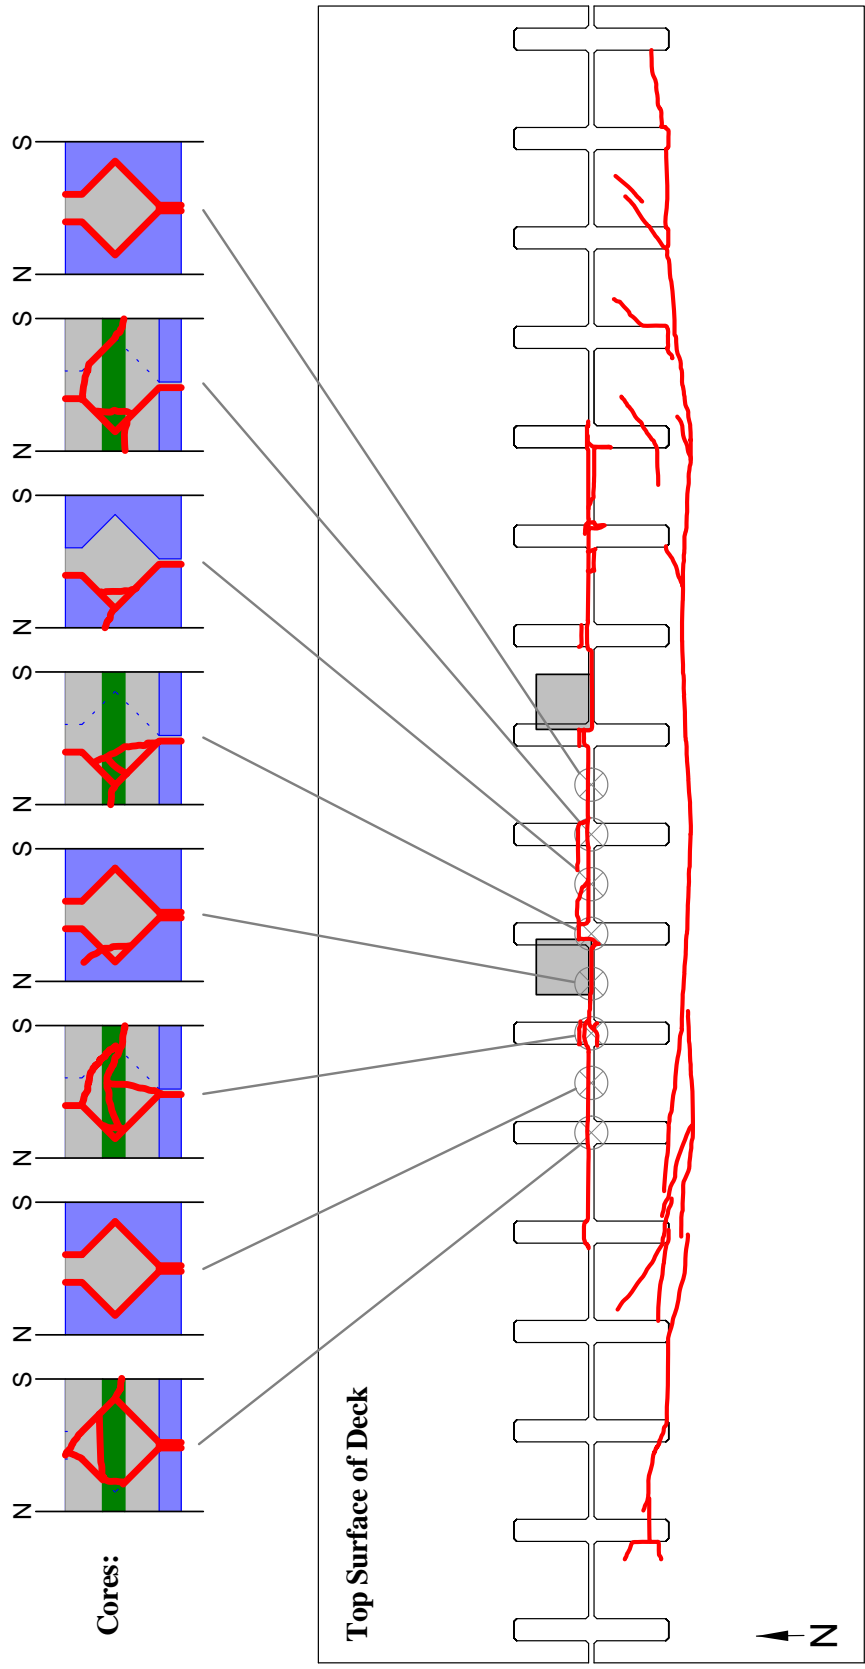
Illustration. Visible cracking in T2J deck and joint after conclusion of test.
